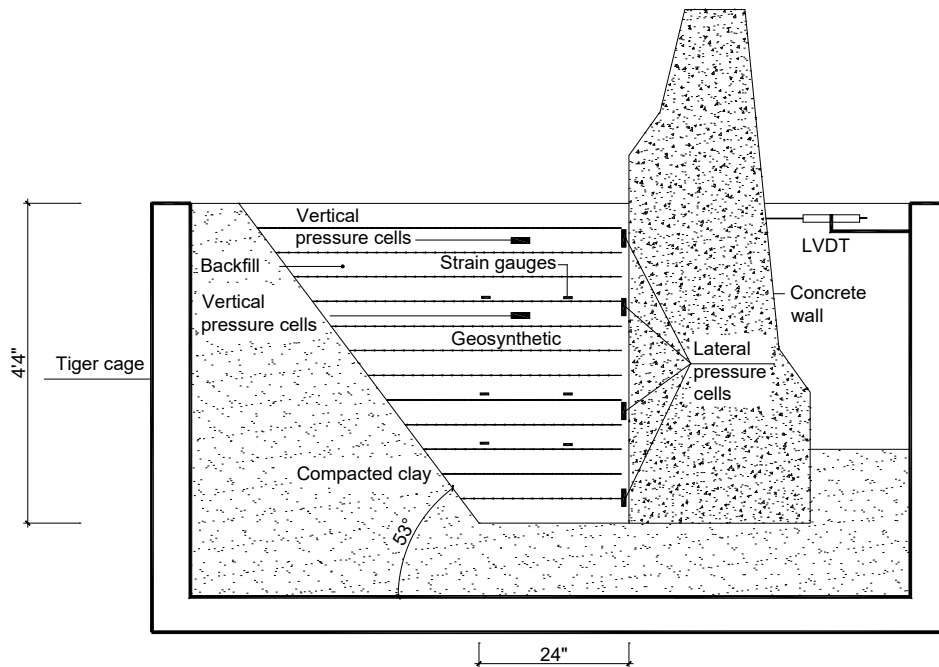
Model test of GRS wall with 3" distance from wall face to geosynthetic tip with 4" geosynthetic spacing (Test 3)
